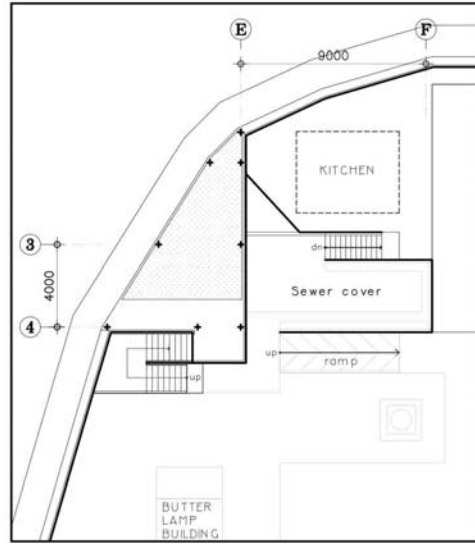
,21. Design development and construction plan of new disabled restrooms in Memorial Chorten.
